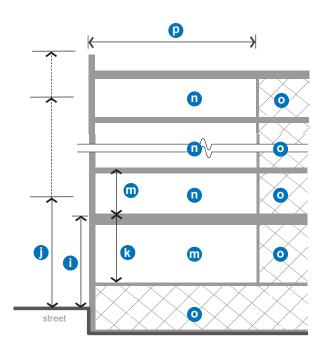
(F)(2) Civic Building: Height and Use Requirements
